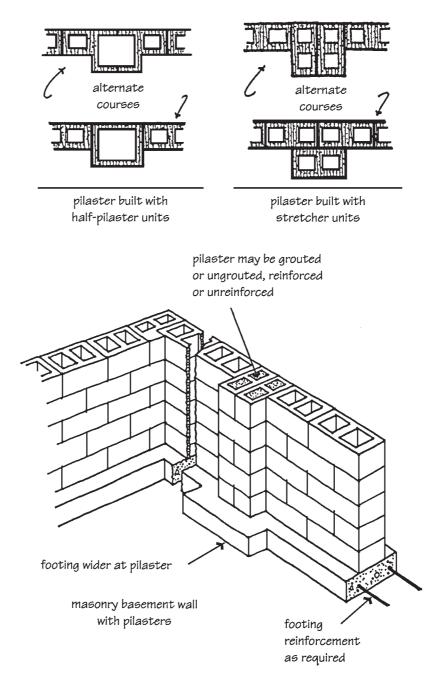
Concrete masonry basement wall with pilasters. (From NCMA TEK Bulletin 1.)
